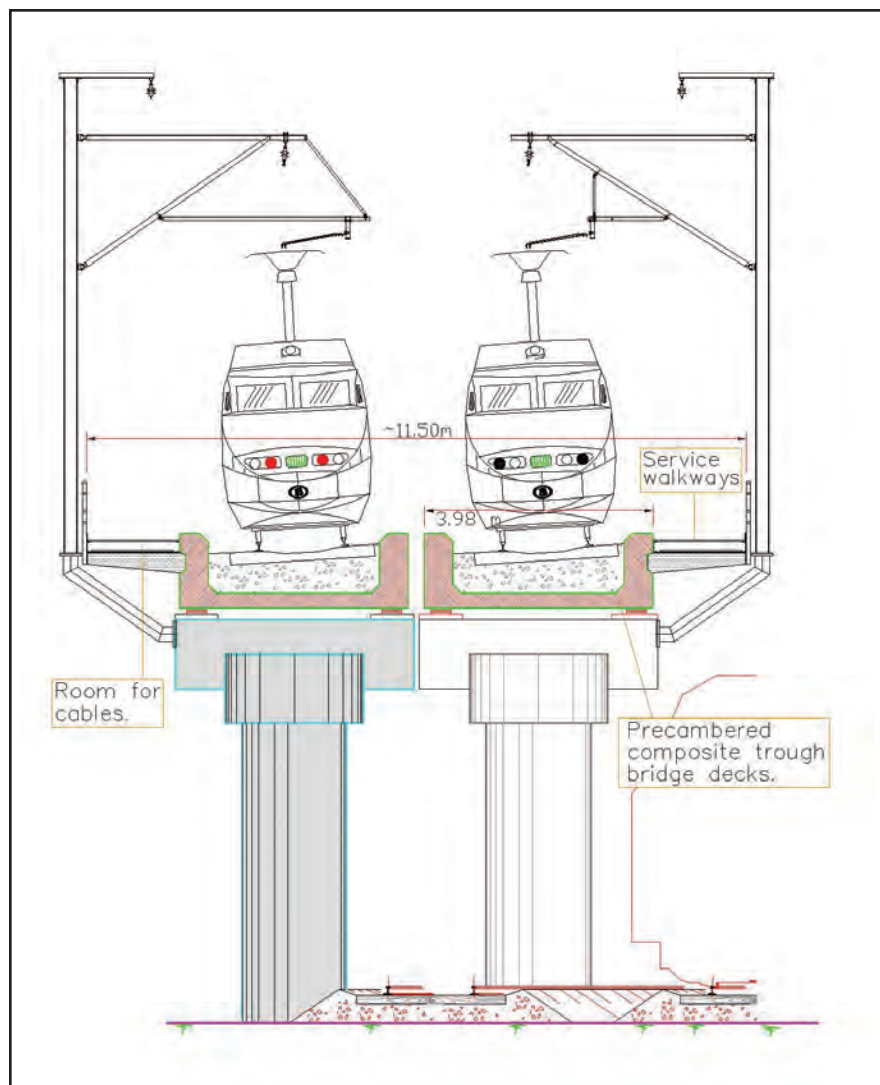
Cross section of viaduct. (Courtesy of Tucrail)
